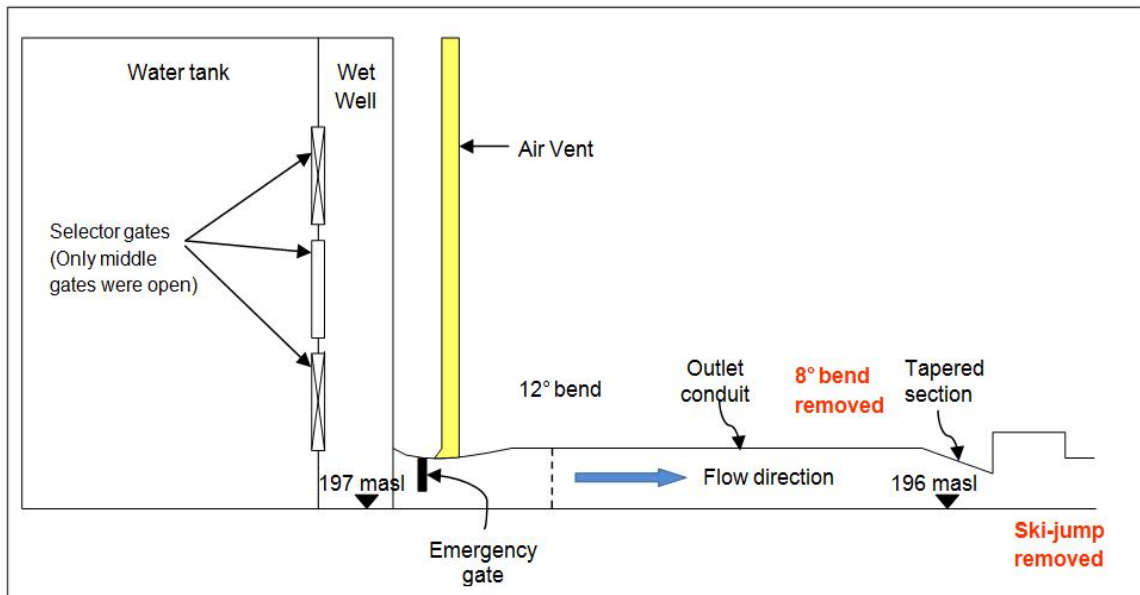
Modification 2 – ski-jump and second bend (8° bend) removed
